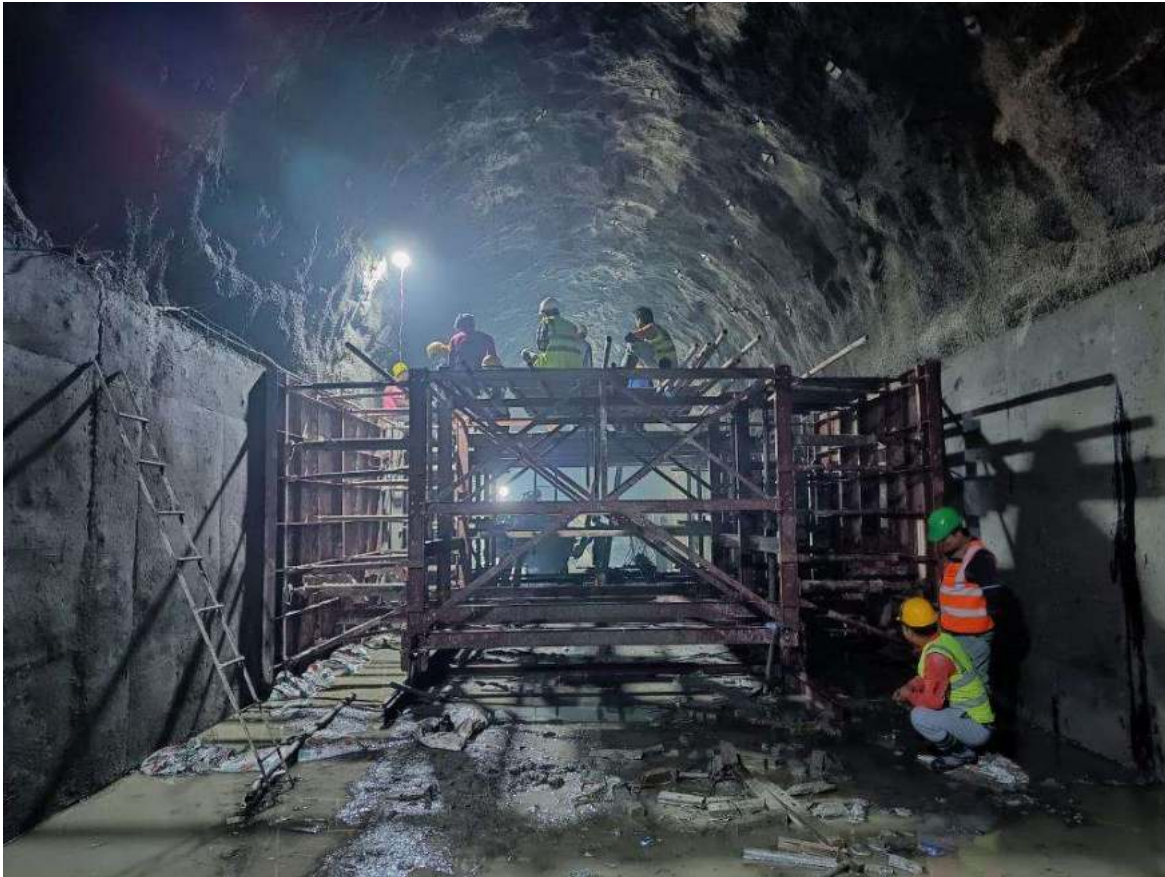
Mechanical formwork for concrete wall lining at HRT (chainage 2+100)
